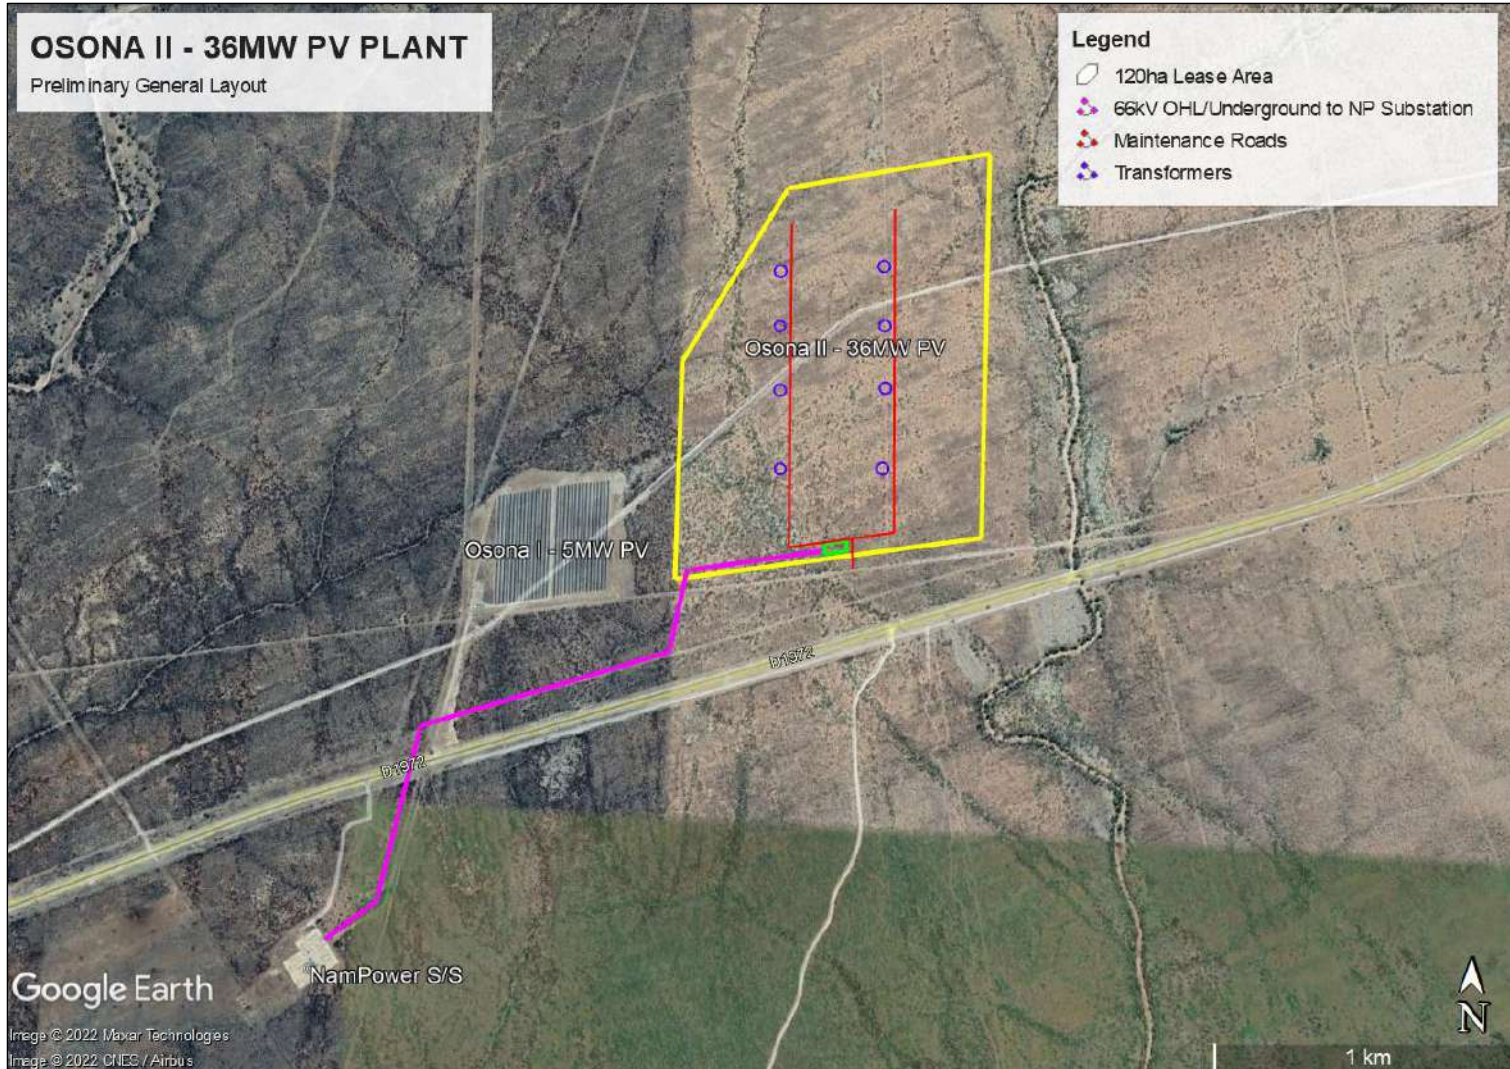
Proposed preliminary general infrastructure arrangement layout.
